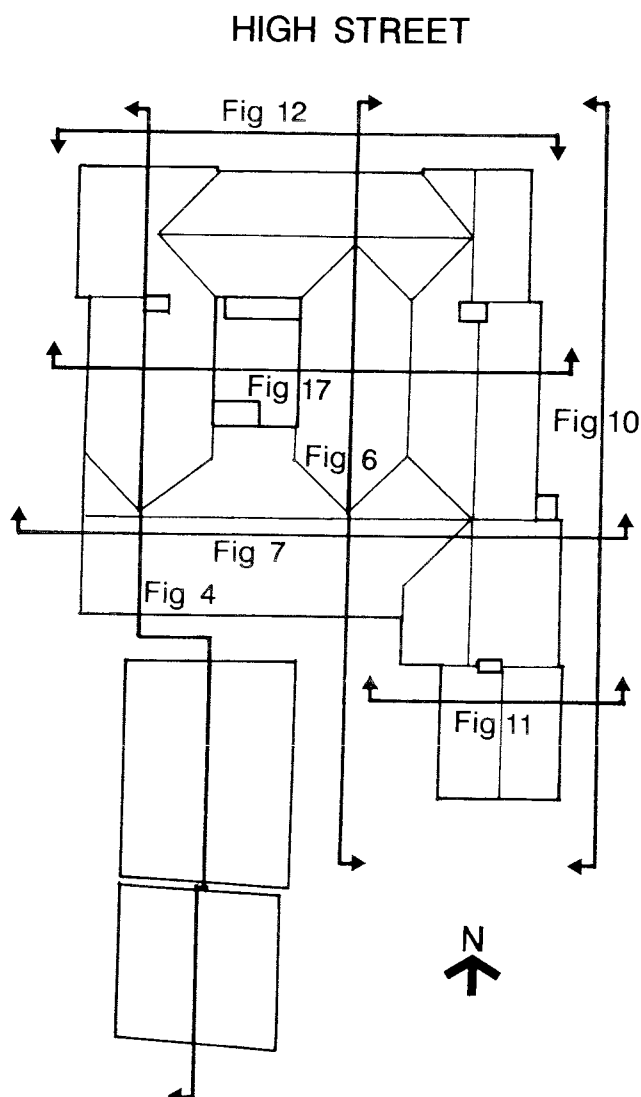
The Red Lion, Colchester. Outline plan showing positions of sections and elevations.
